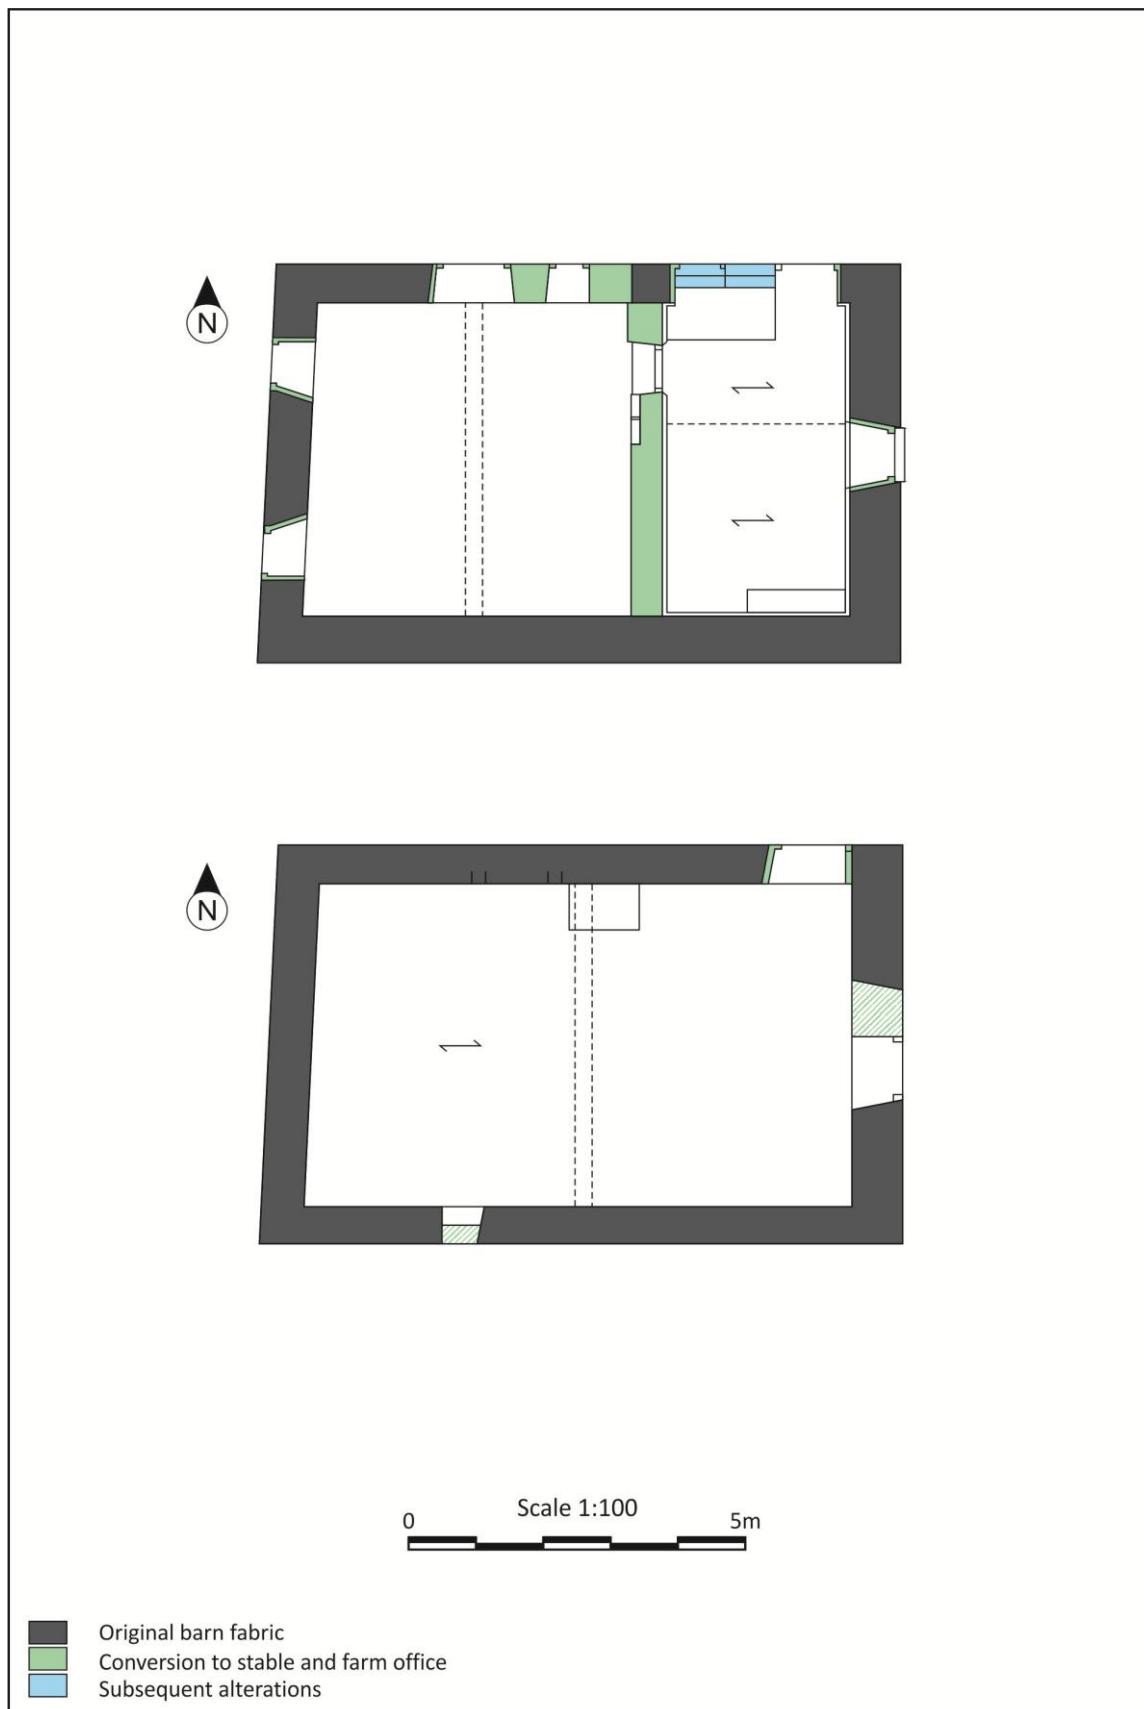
The barn, floor plans: Ground floor (top); First floor (bottom)
